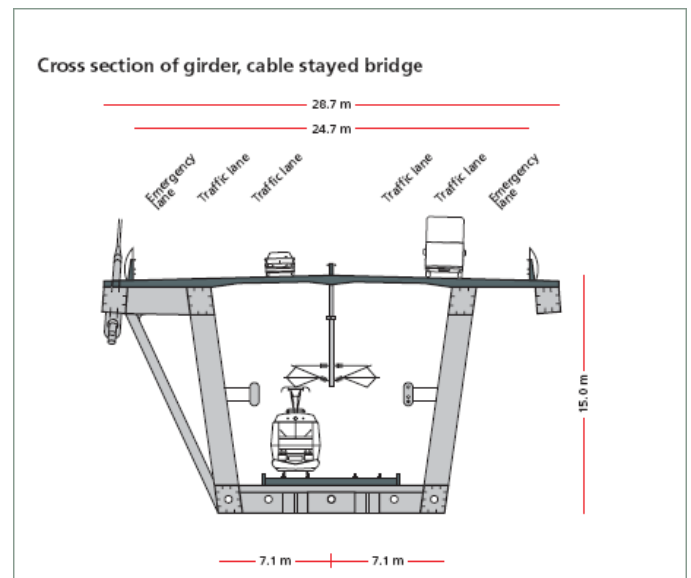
The double-deck girder section on the part of cable-stayed bridge [www2008].
